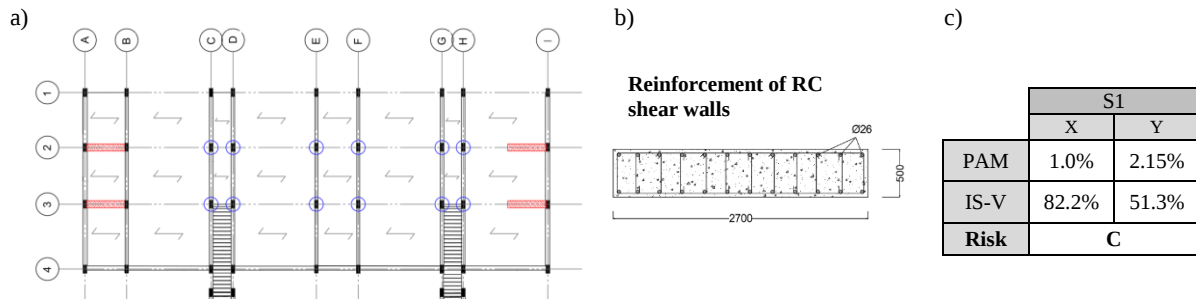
a) Placement of reinforced concrete shear walls and FRP, b) Section of the shear wall, c) risk class for S1
